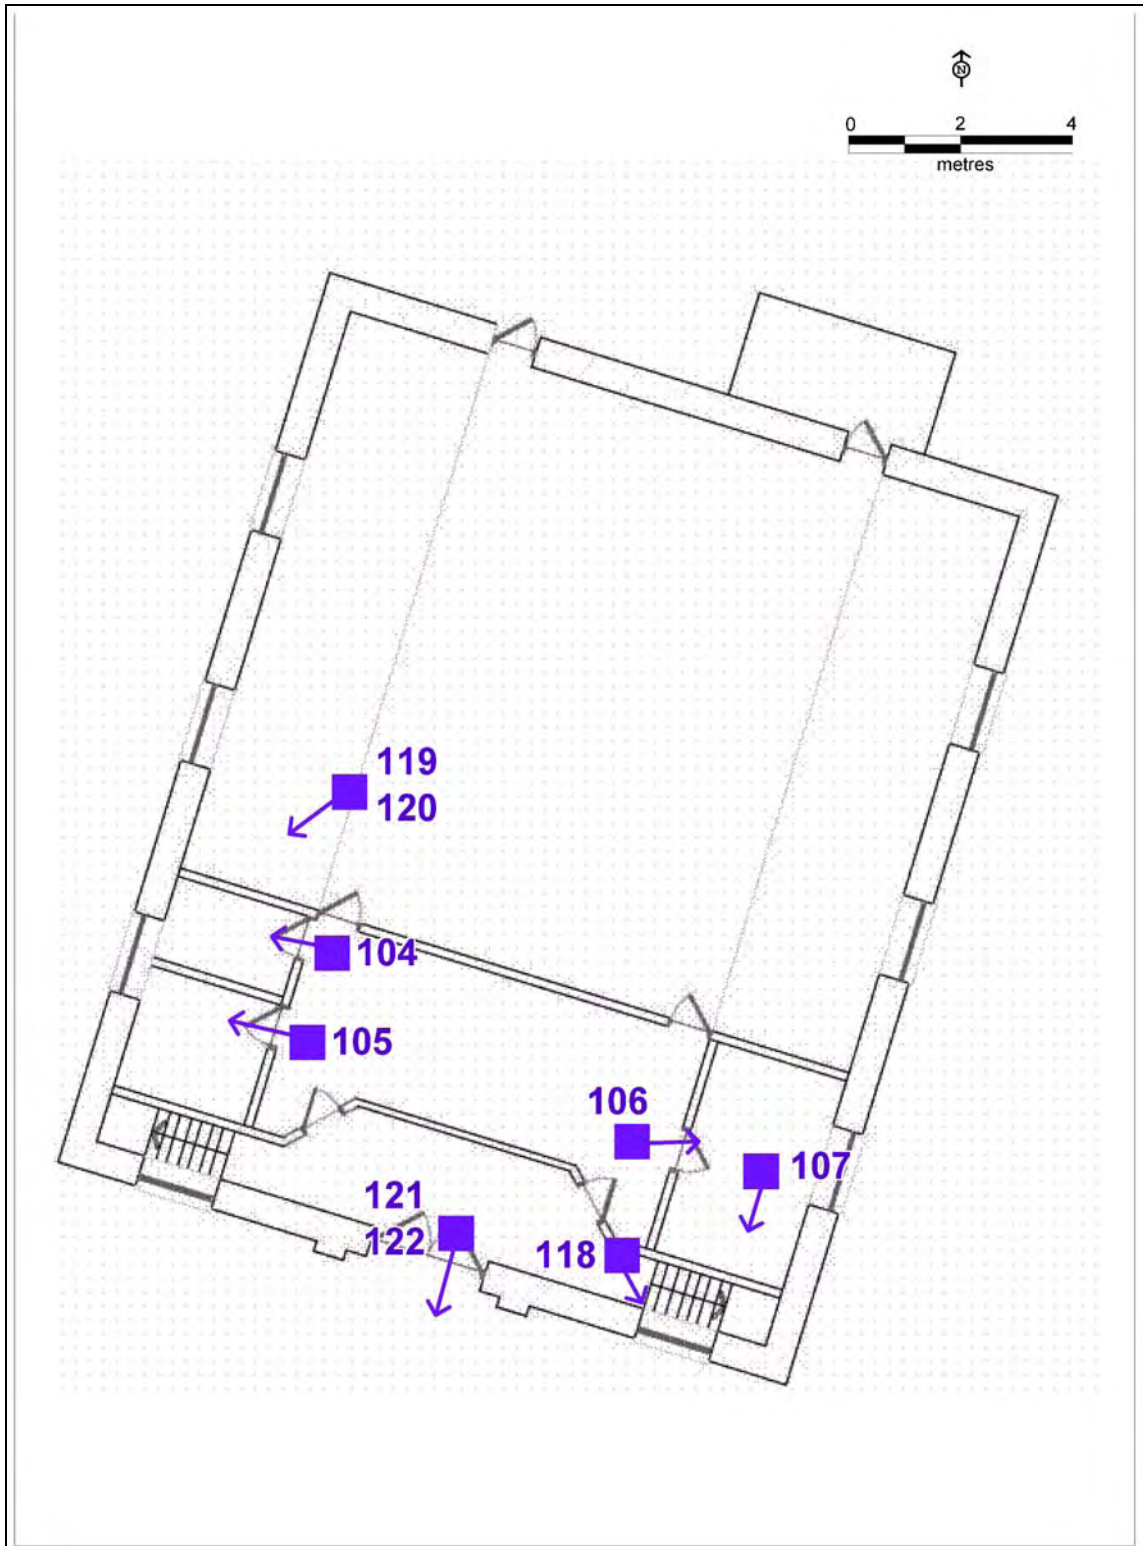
Location of photographs. Internal views of ground floor of chapel, see also Figures 8 and 10.
